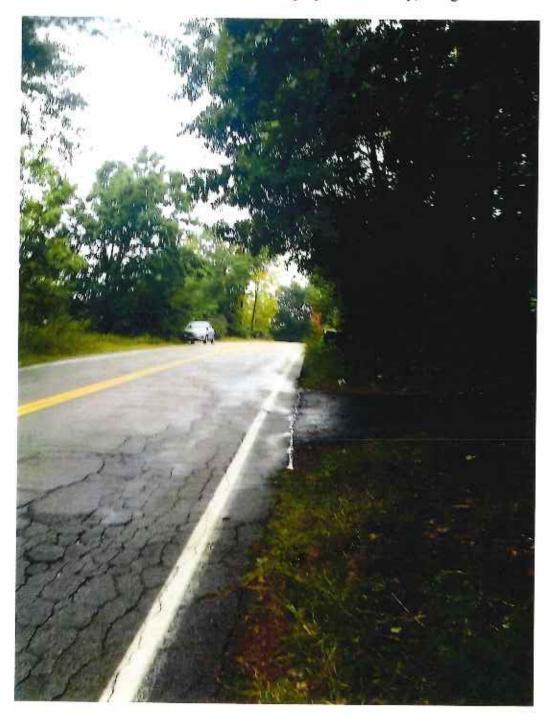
Looking left, from the location of the proposed driveway, along Pelham Road.
